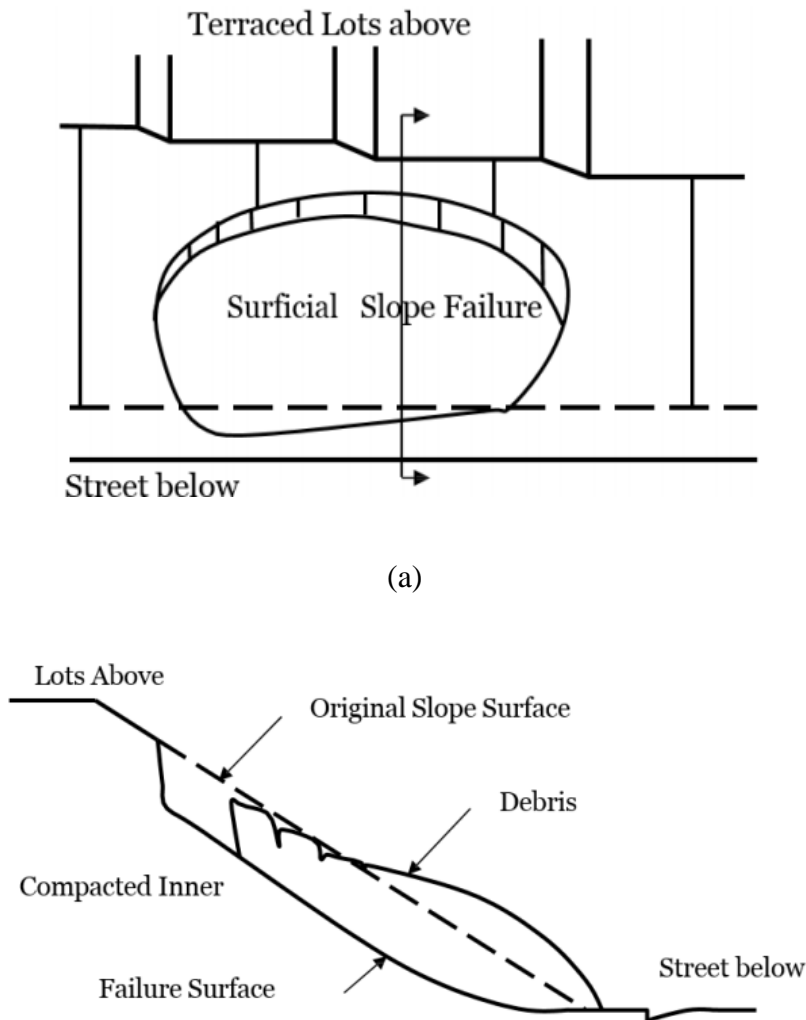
Typical surficial slope failure (redrawn after Day and Axten, 1989).
